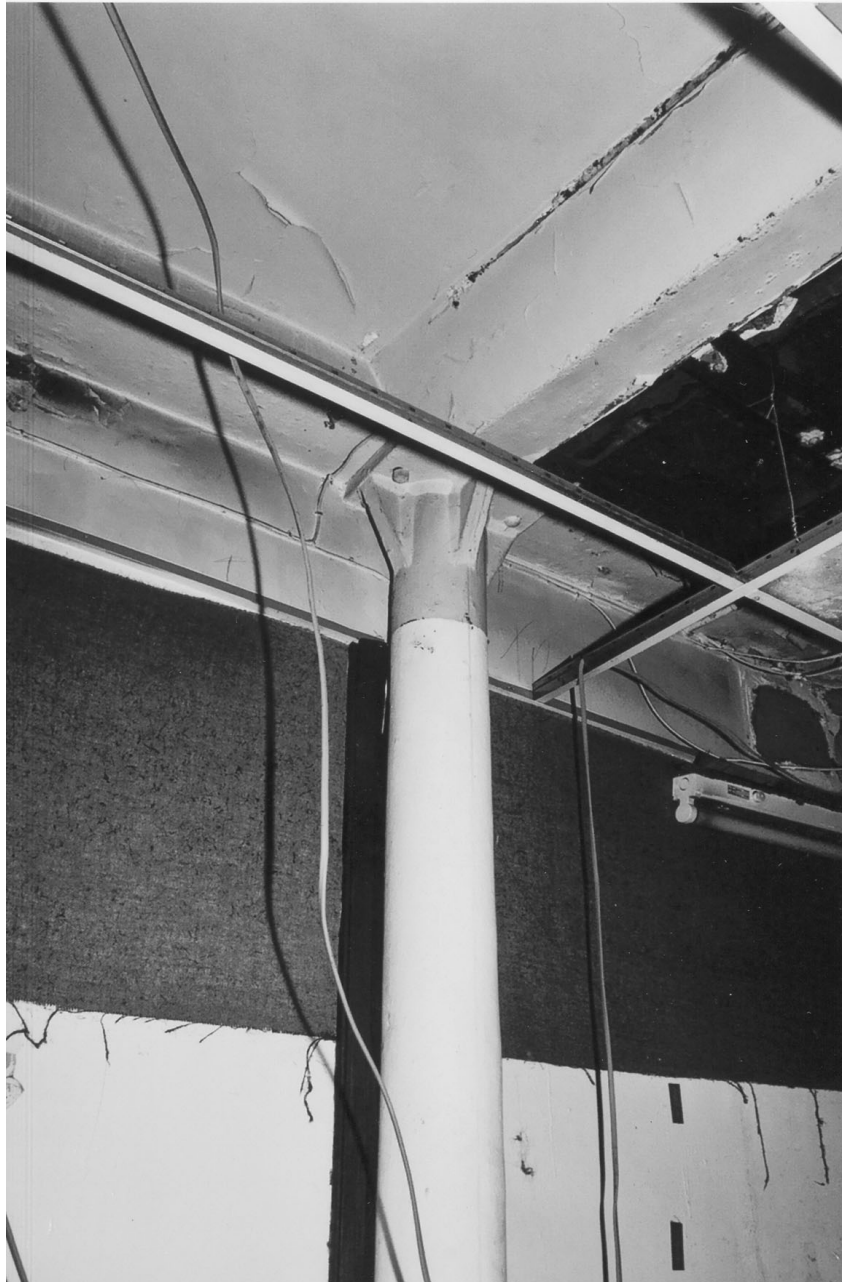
33 High Bridge, Basements, room C10. Cast iron column
